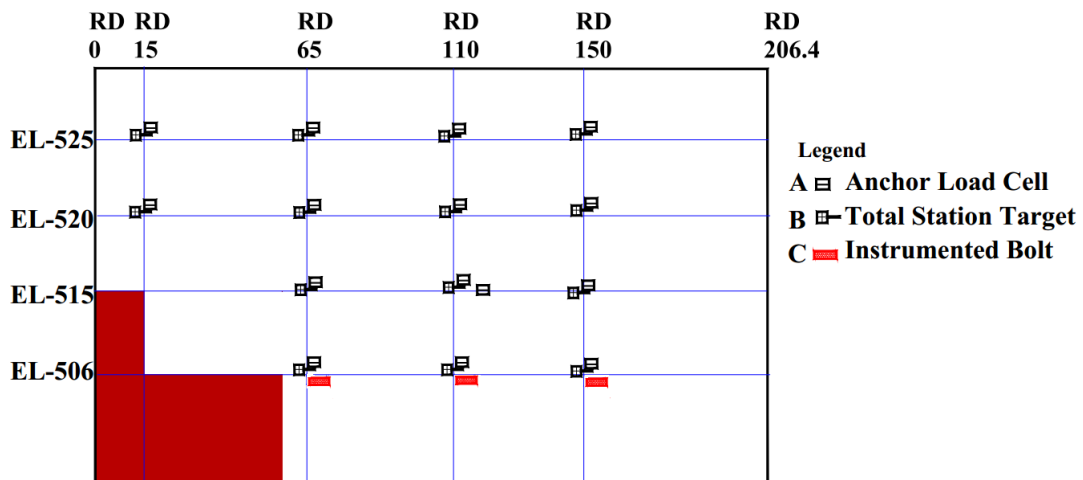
Longitudinal section of the powerhouse cavern showing location of instruments on downstream wall
